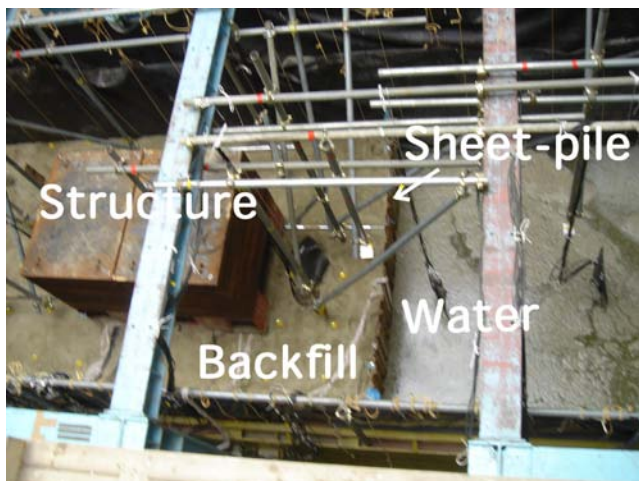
Model condition of soil, water, structure and sheet-pile wall before shaking
